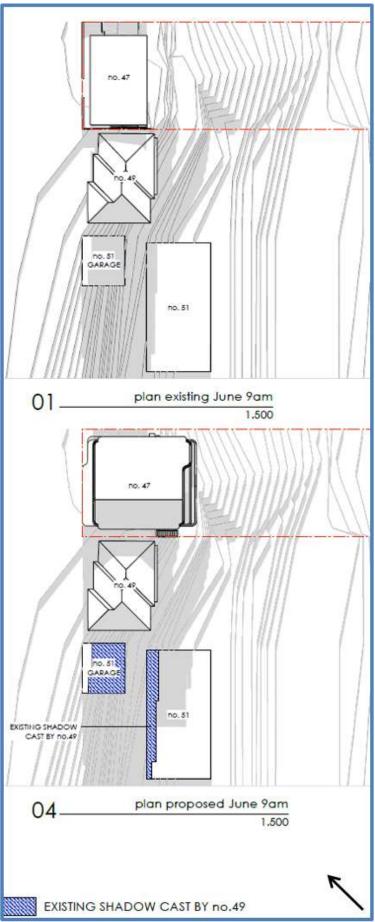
Shadow diagrams - in plan, 9am mid winter.
